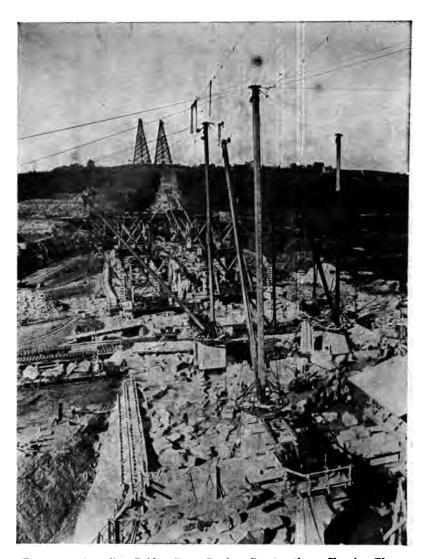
The Olive Bridge Dam During Construction. Showing Plums
